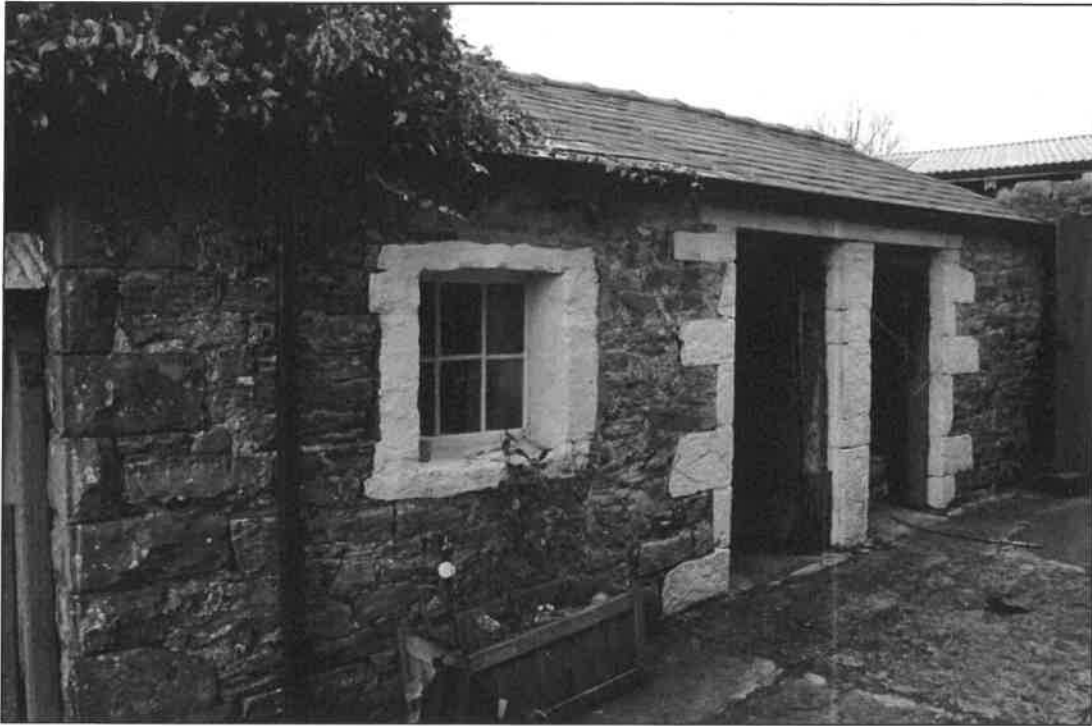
Domestic outbuildings (wash-house/dairy), to be incorporated within proposed extension
